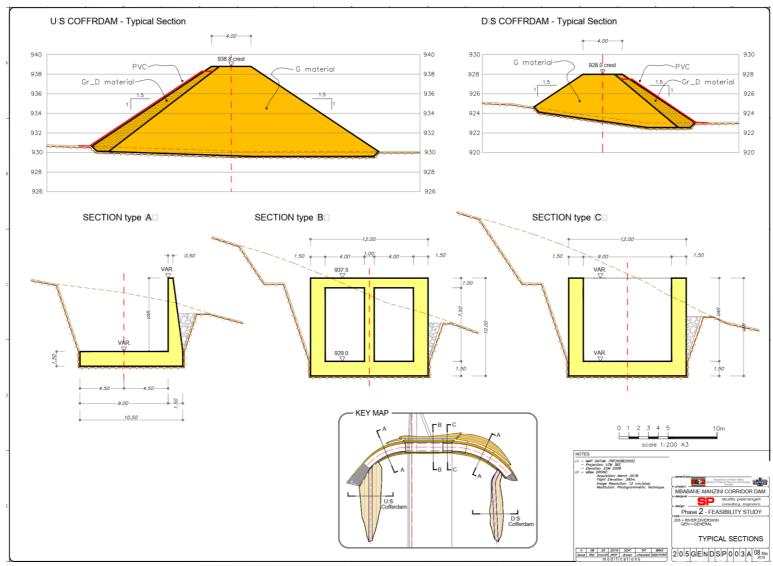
Layout Showing Typical Cross Sections of the River Diversion Works (Studio Pietrangeli, 2019)
